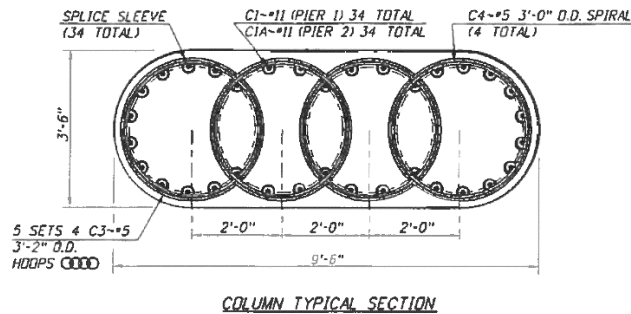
Salmon River Bridge Column Section with Steel and Grouted Coupler Locations (NTS)
